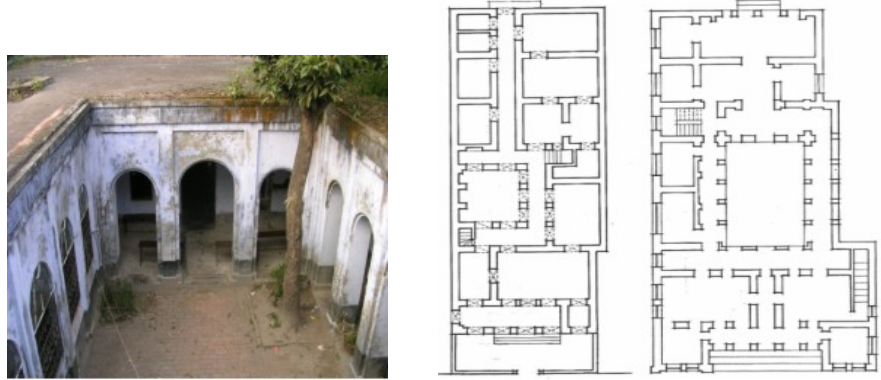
(a) View of Central courtyard (b) Plan of central courtyard type building: Building no. 36 and Building no. 40
